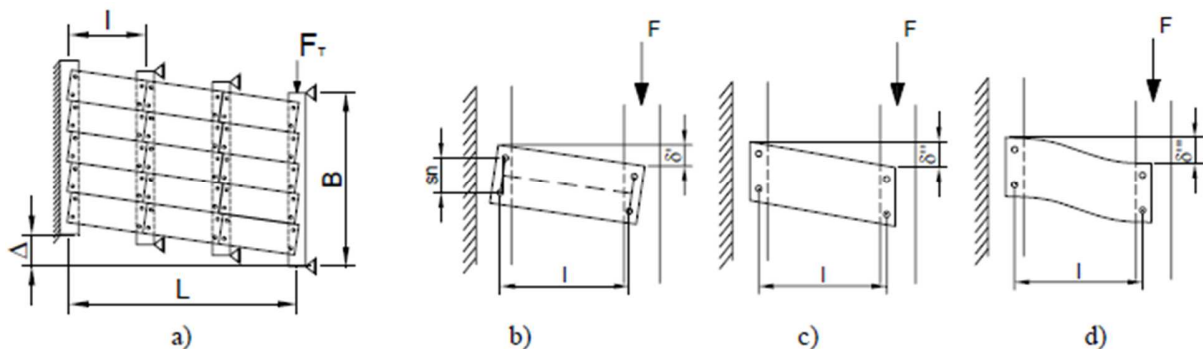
In Plane Deformation of a Single Straight Sheathing Timber Floor; B) Rigid Rotation of the Board due to Nails Slip; C) Board Shear Deformation; D) Board Flexural Deformation, Brignola [18].
